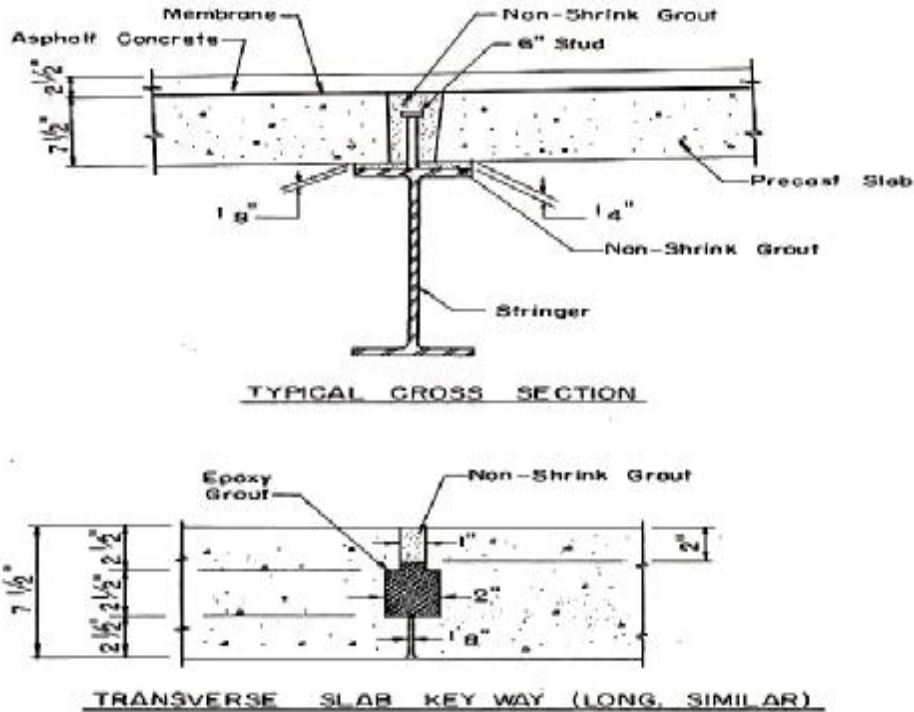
Connection details of the Delaware River Bridge
